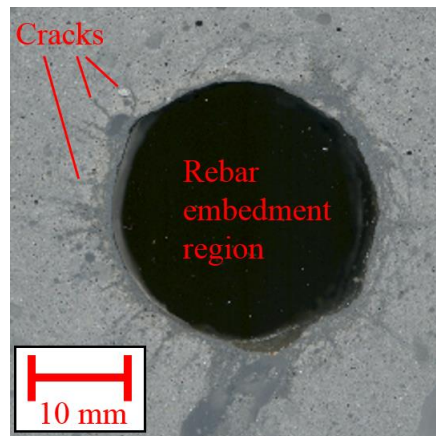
Splitting cracks for ECC-NC after no. 8 rebar pull-out
